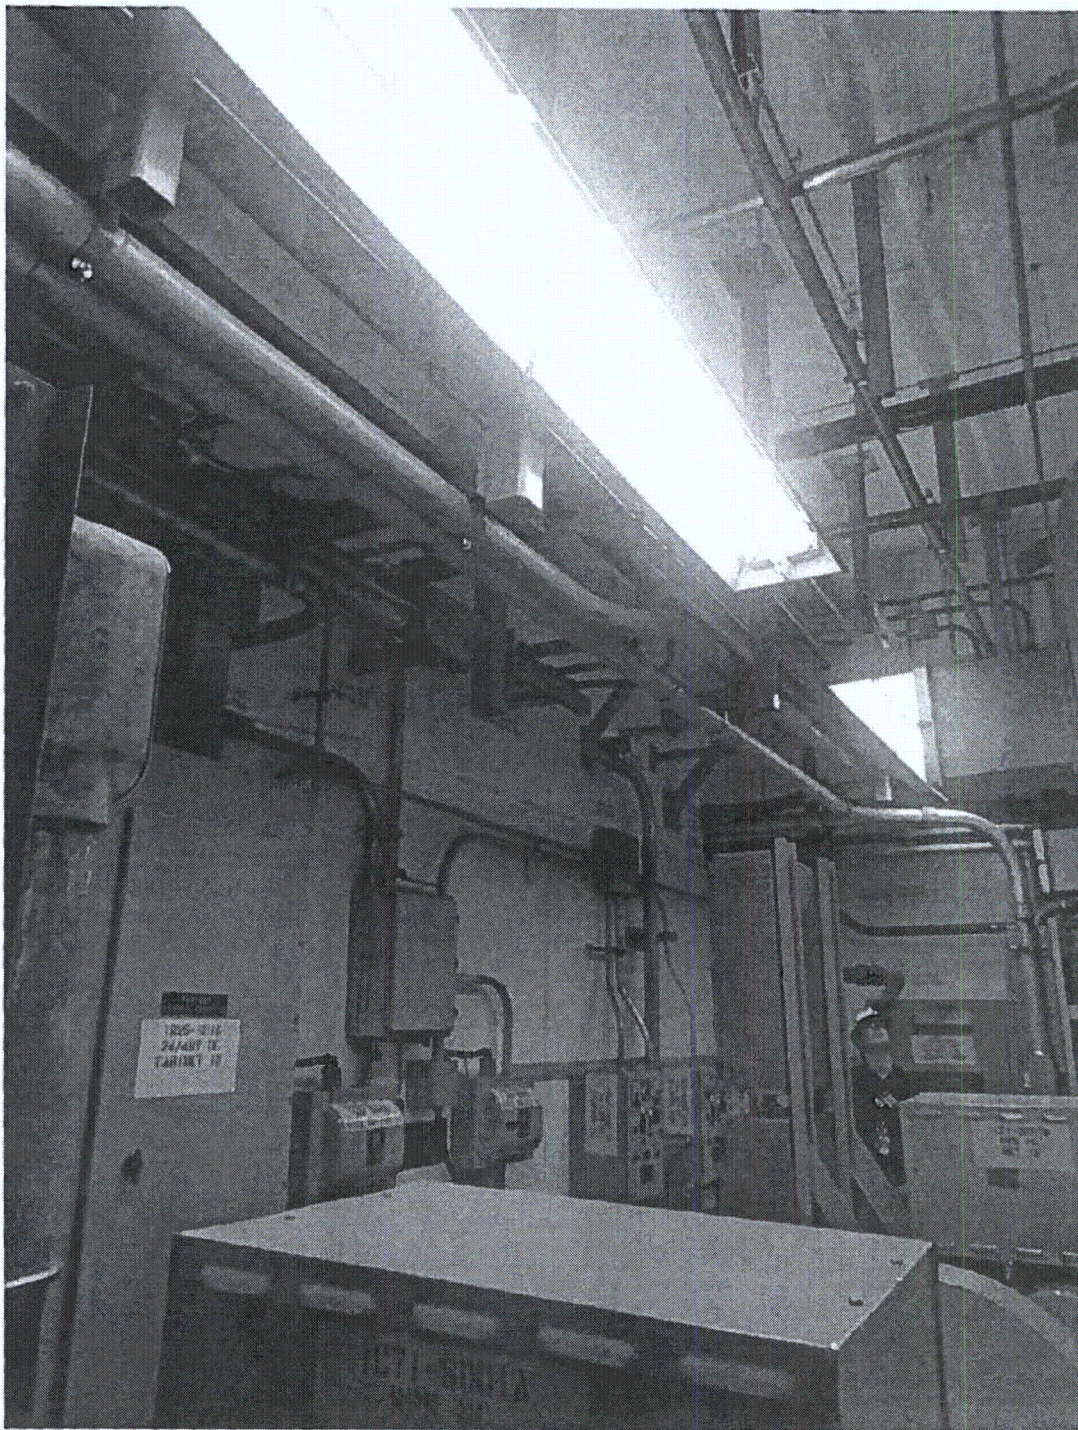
Light Fixture over Motor Generator (1C71-S001A)
